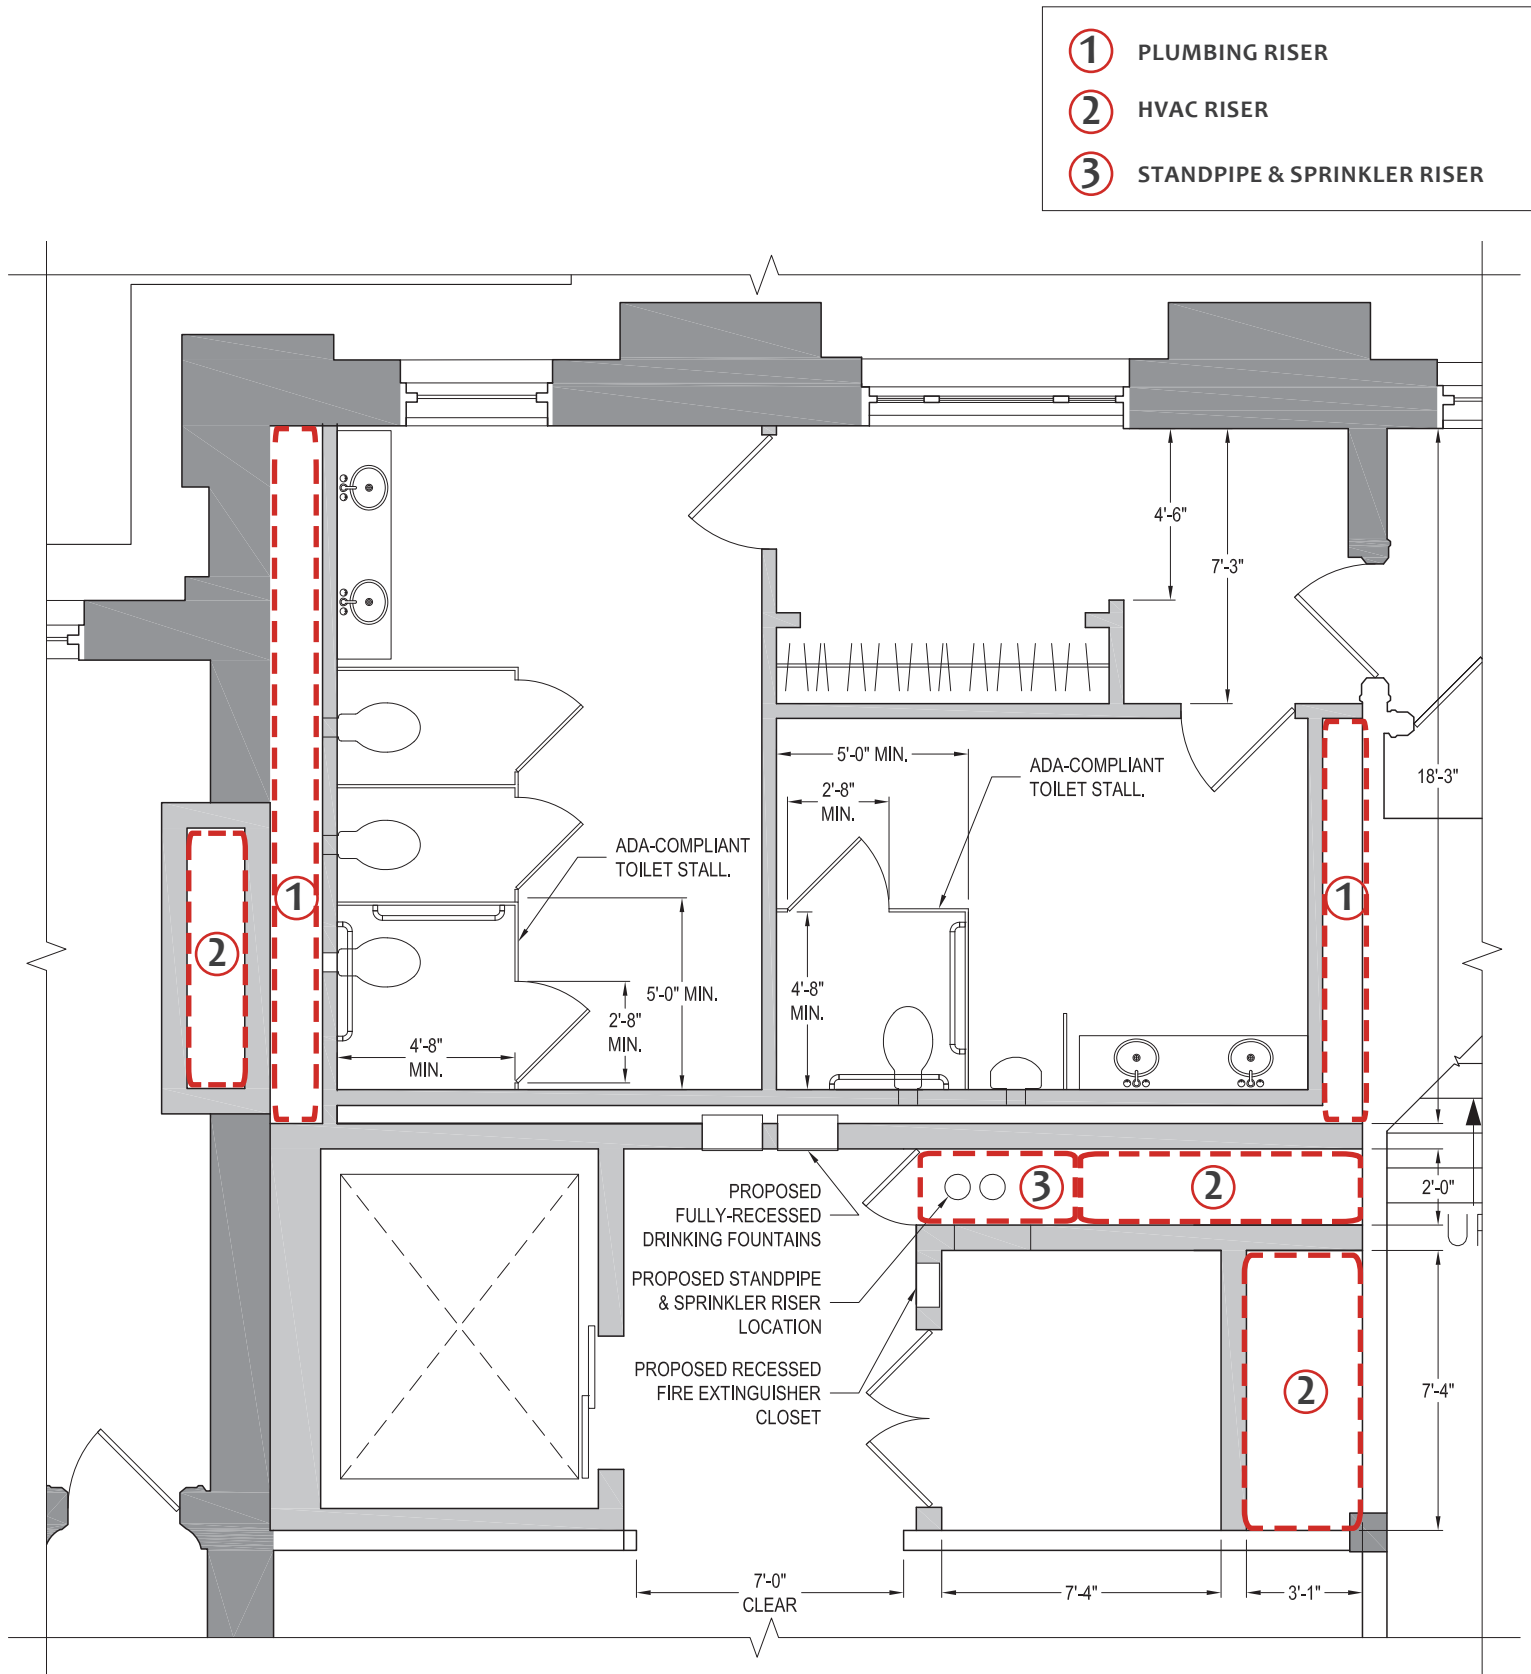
Second Floor Level [East] Proposed Service Core.
